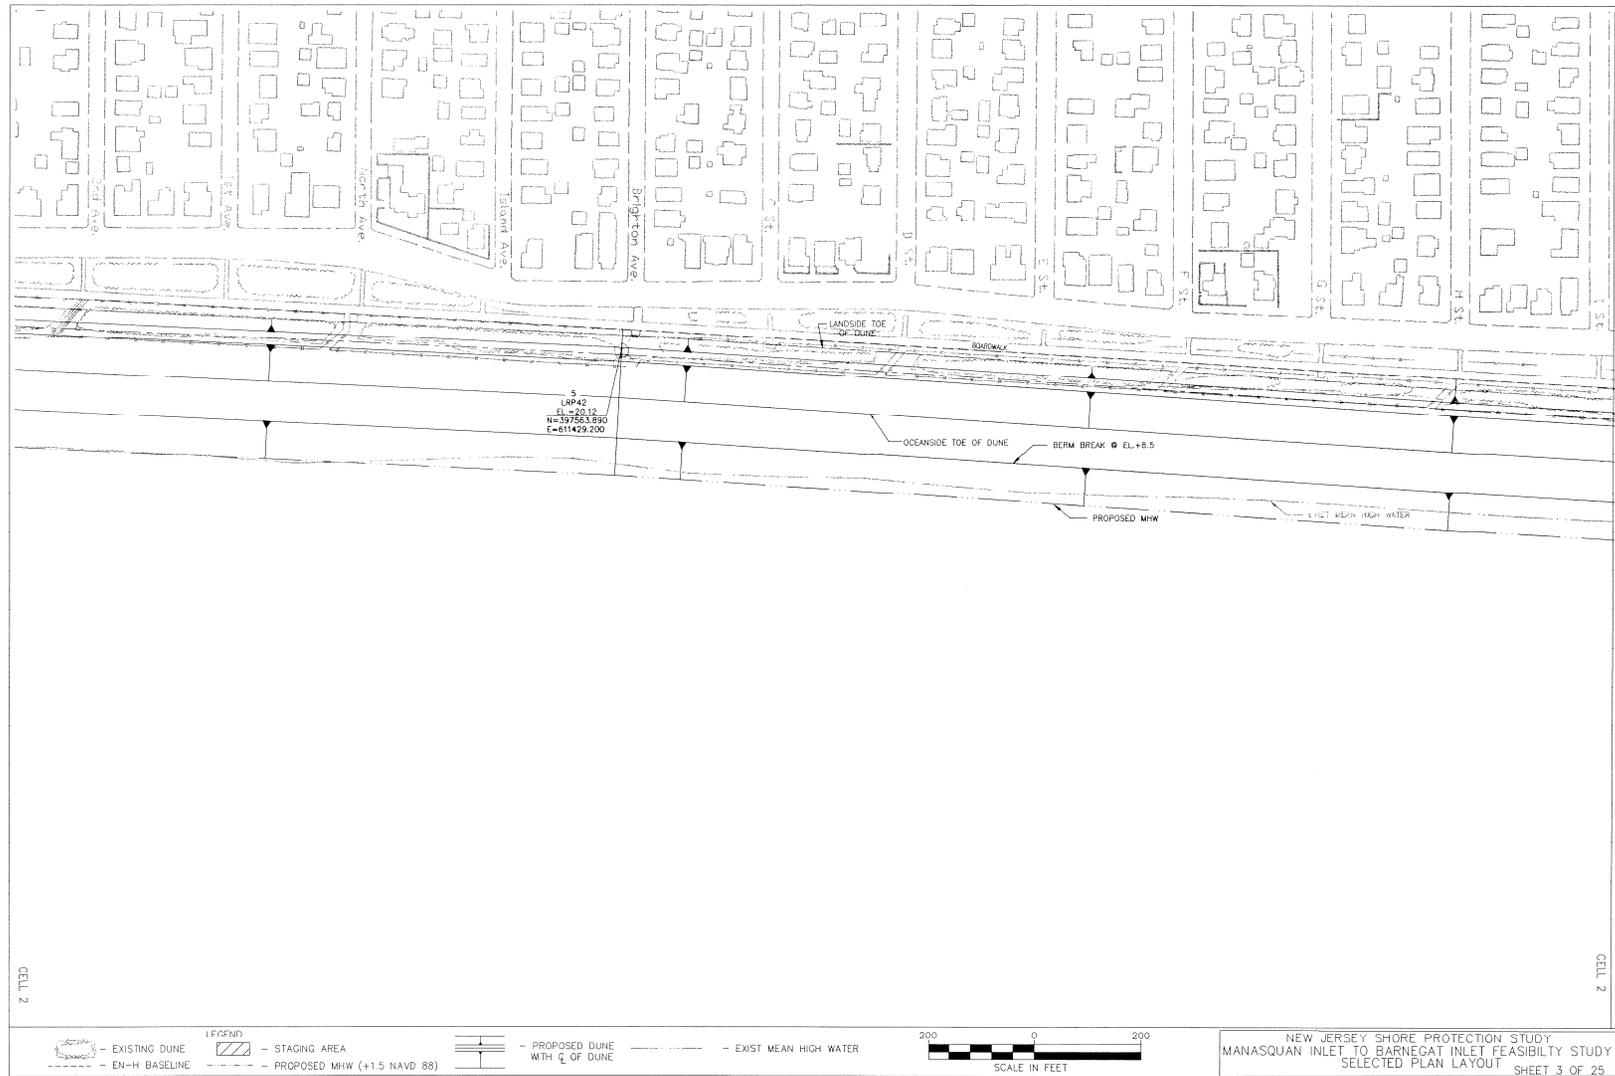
Selected Plan Layout – Seaside Park Borough, 2nd Avenue to I Street
